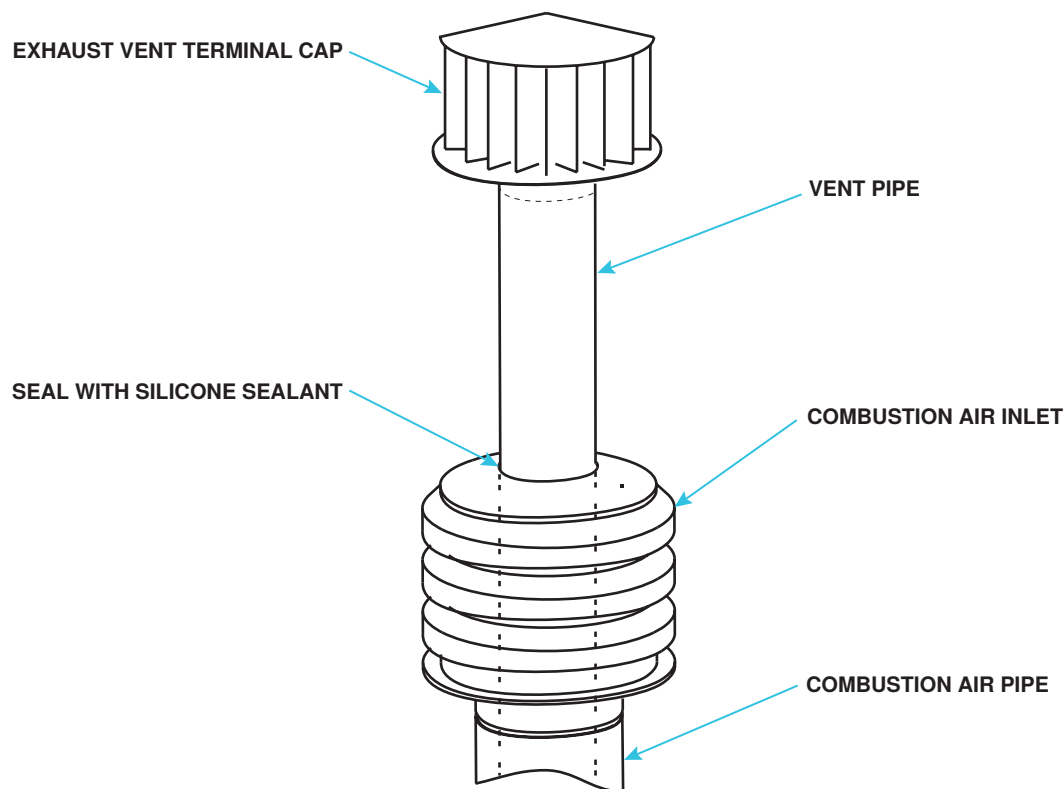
Combustion Air Inlet and Vent Terminal Installation
